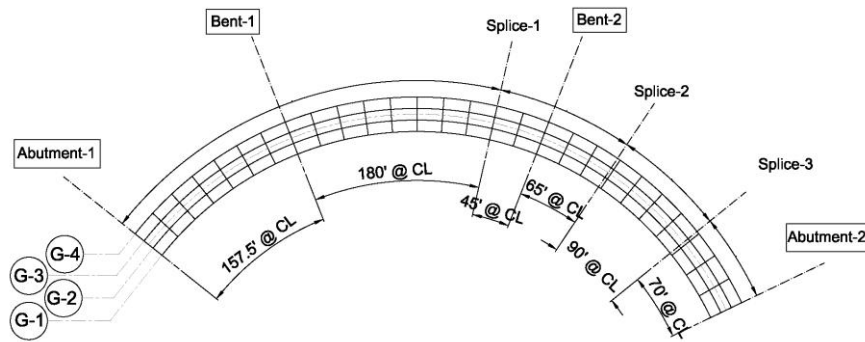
Simplified Framing Plan, Bridge C11: Unbalanced, Three-Span, 4-Girder, 91.4 Radius, R/L=13.3
